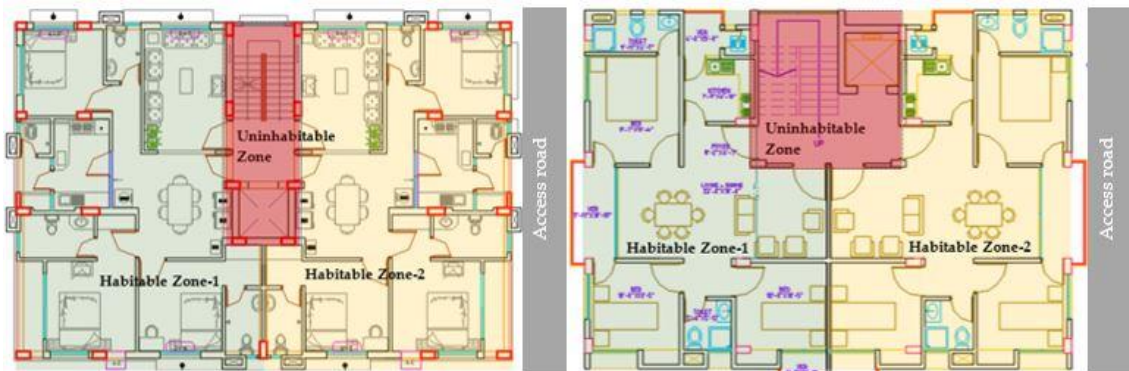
Typical Floor Plans with Double-unit Apartment (Type B). Source: Field Study
